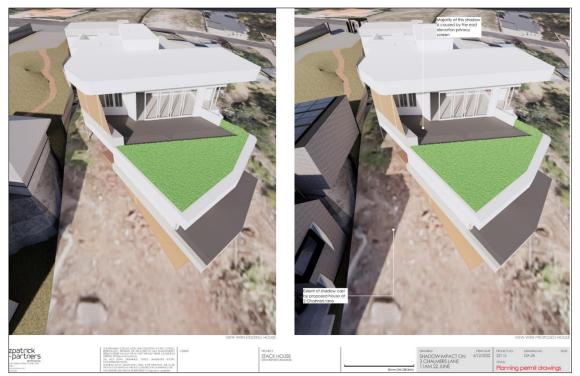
Overshadowing cast by the current and future dwellings on 3 Chalmers Lane 11am, 22nd June (Source: Fitzpatrick + partners architects)
